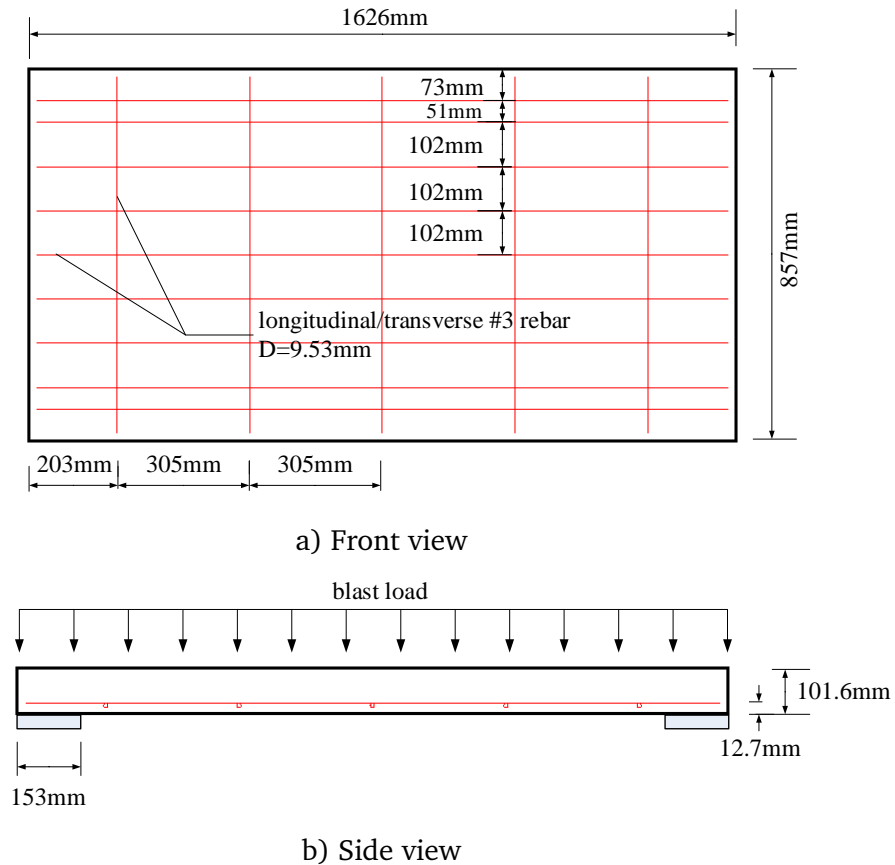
Details of tested RC slab (after Thiagarajan 2013)
